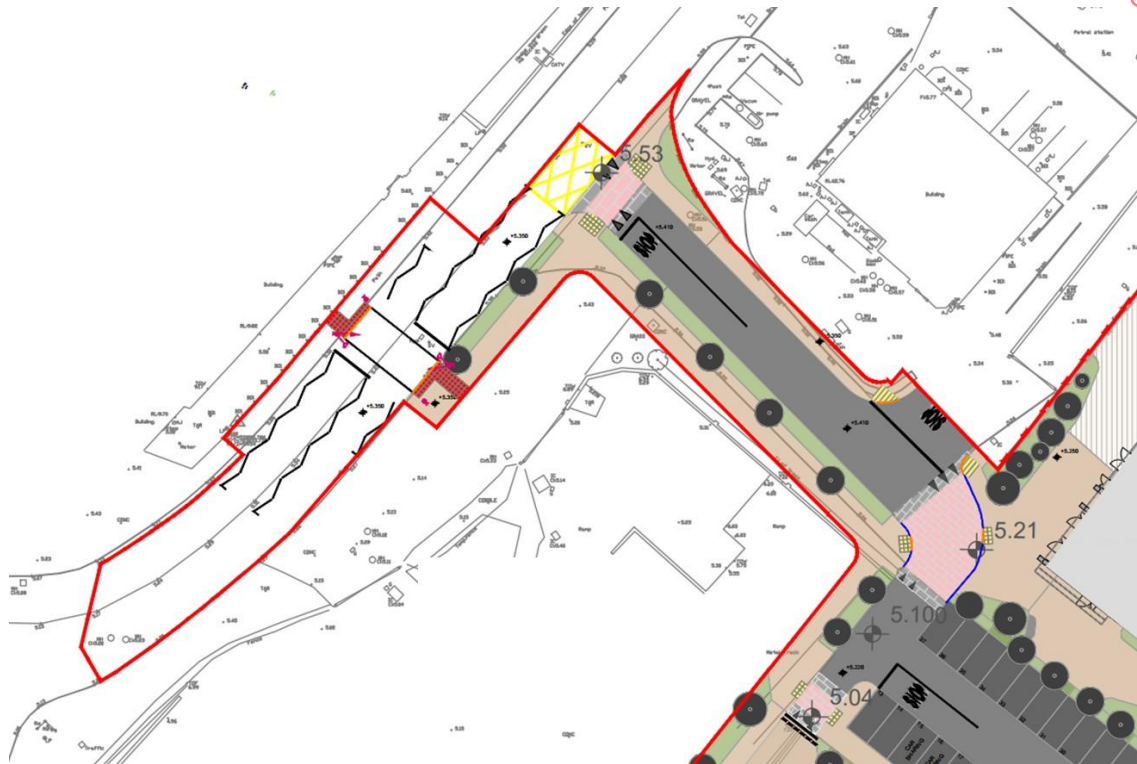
Proposed Lough Atalia Road Site Access Junction
